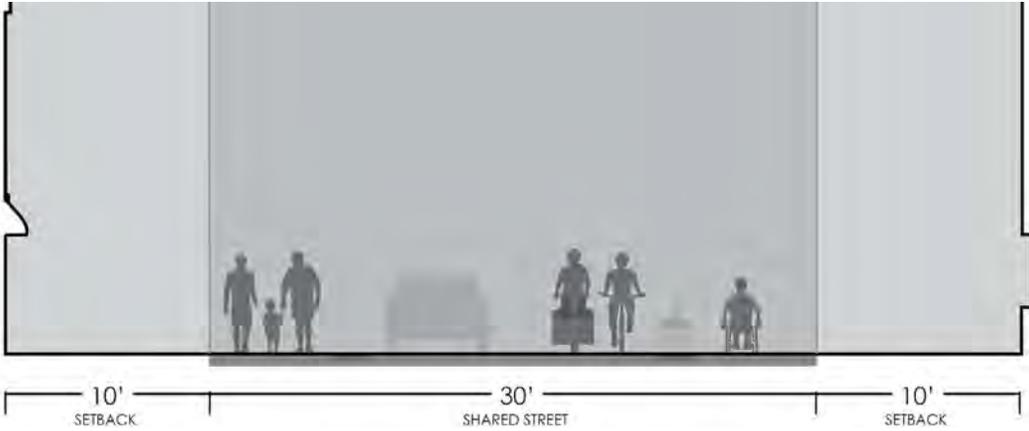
Section B: Shared Street on Arcadia Avenue.
